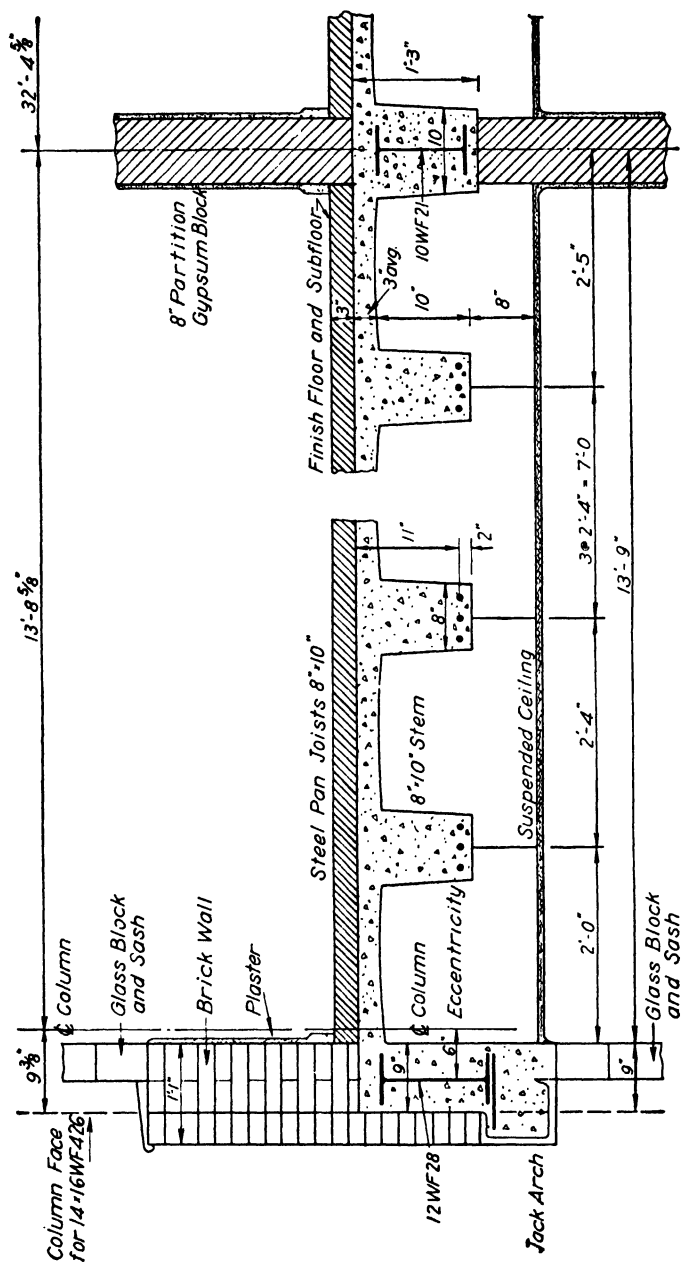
SECTION THROUGH THE CORRIDOR AT ANY FLOOR.
